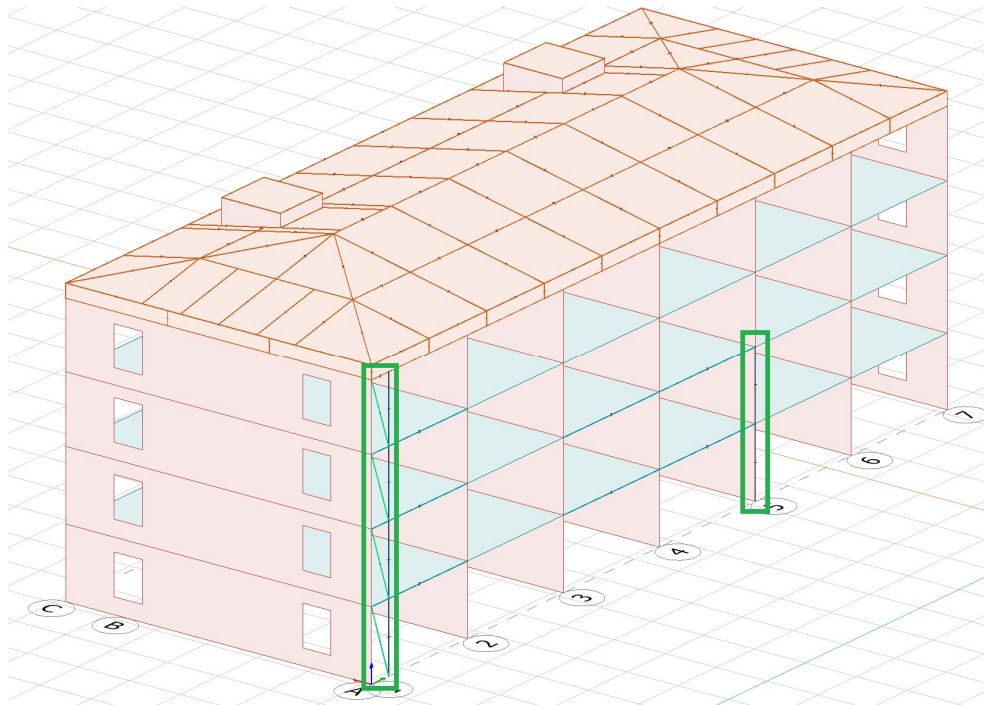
Strengthening wall and slabs with steel columns and wind braces.
